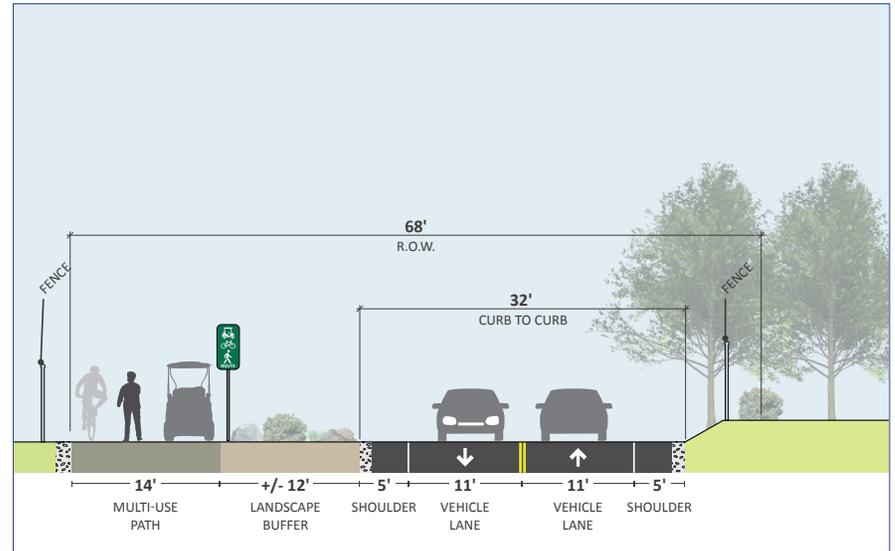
Proposed Street Section of Magnolia Road with Widened Multi-use Path (looking east)
